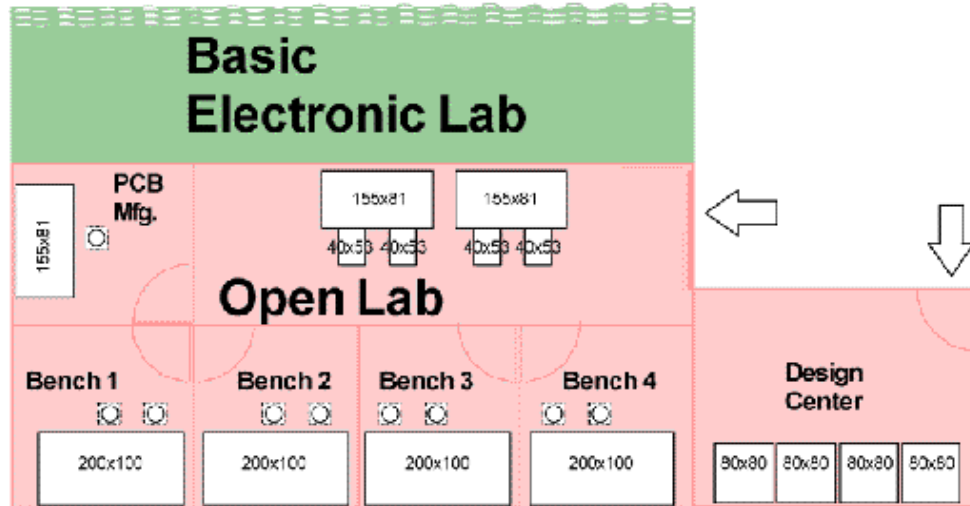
The Open Laboratory (dimensions in cm). A typical product cycle goes from the Design Center to the PCB Manufacturing Room and then to one of the four measurement benches.
